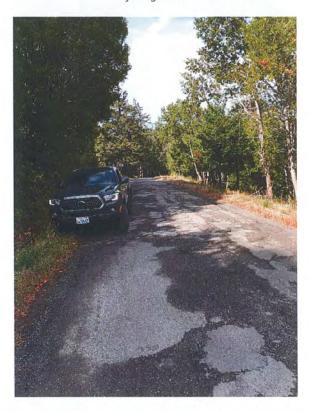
RP 5. Typical section of Chambers Rd (County maintained. State Road No.: 2D020). Vehicle traveling east, photo taken facing west.
